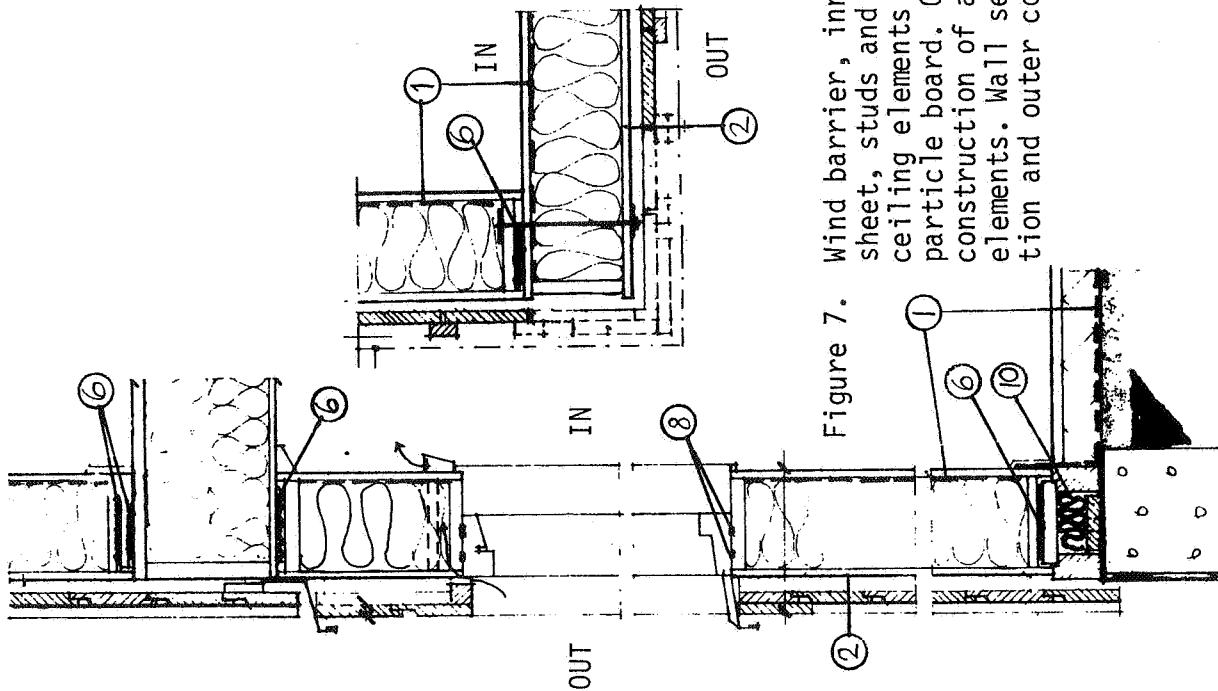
Wind barrier, inner sheet, studs and ceiling elements of particle board. Glued construction of all elements. Wall section and outer corner
